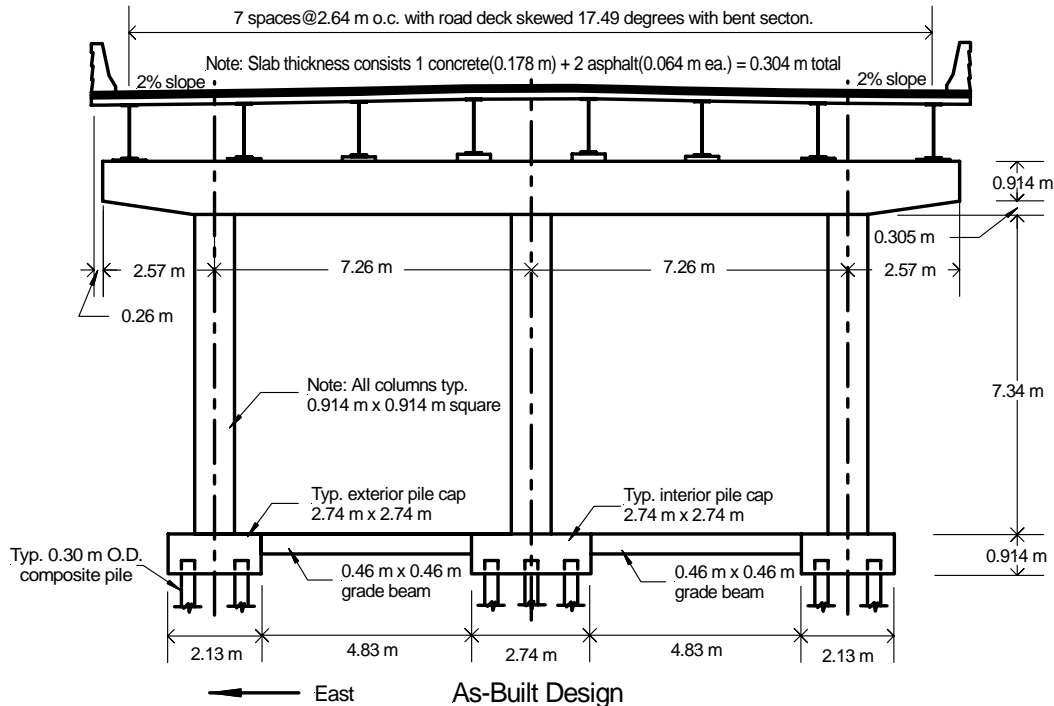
Typical bent structure for both the 1998 and 2000 bridge tests
